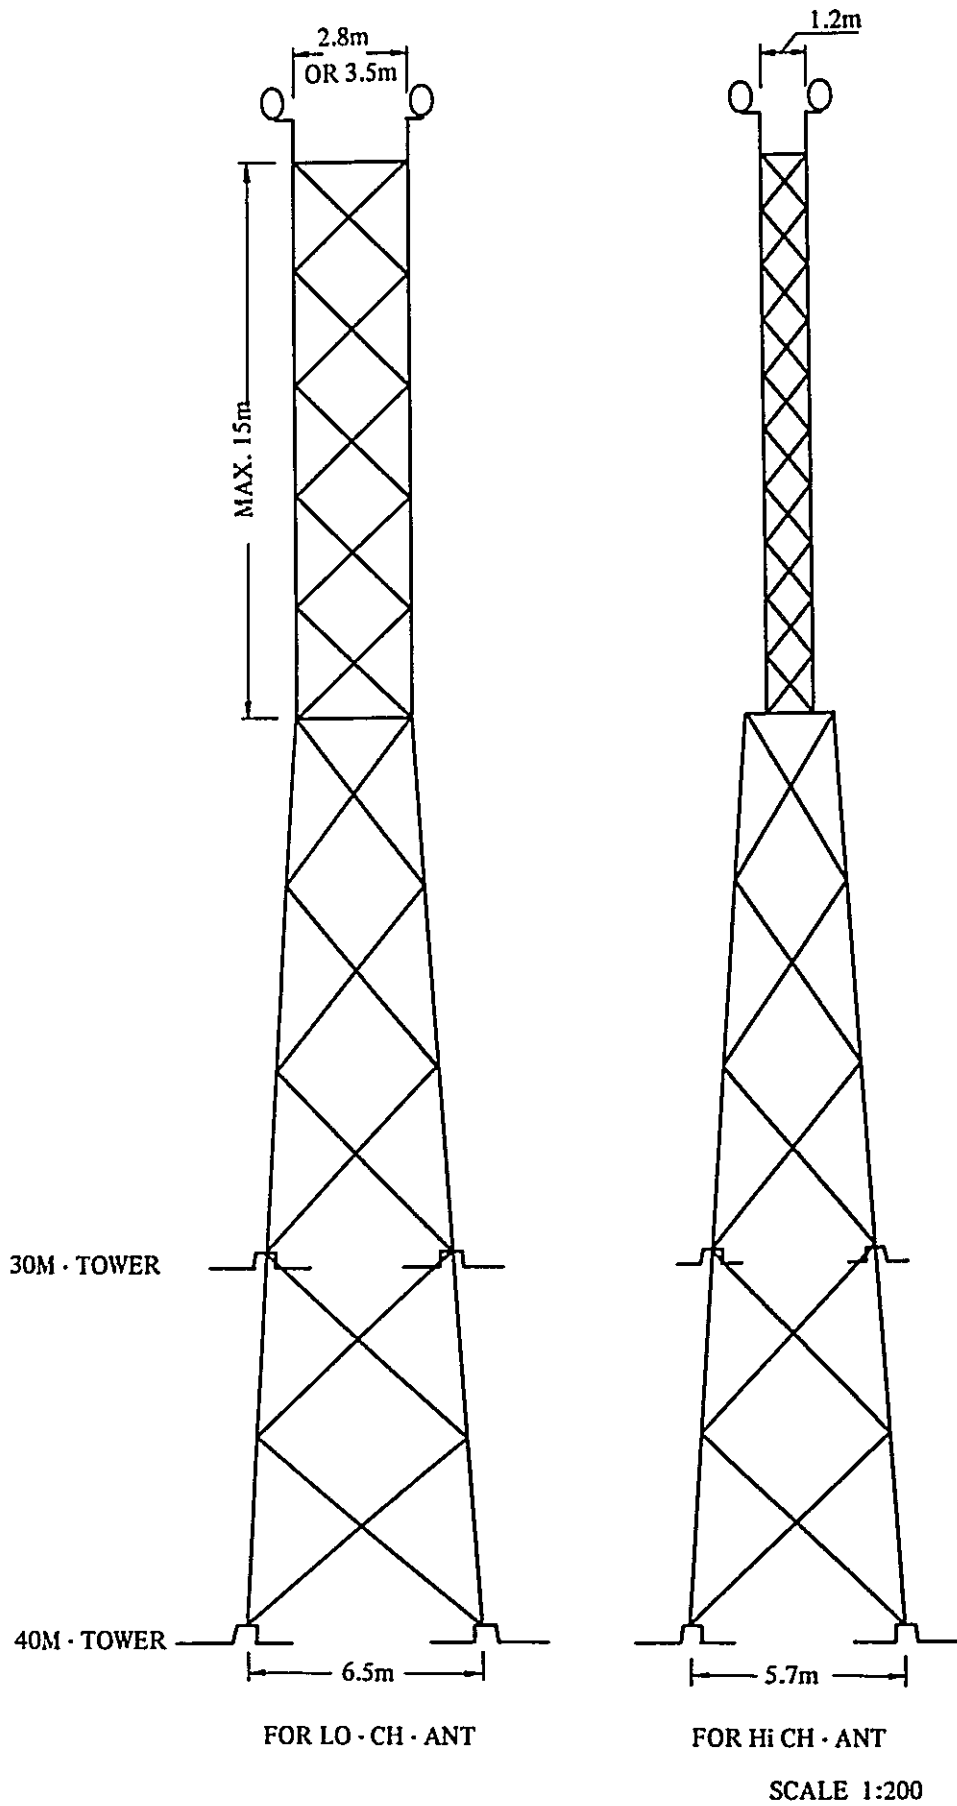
Plan of Self-Supported Tower (Less than 40m Height)
